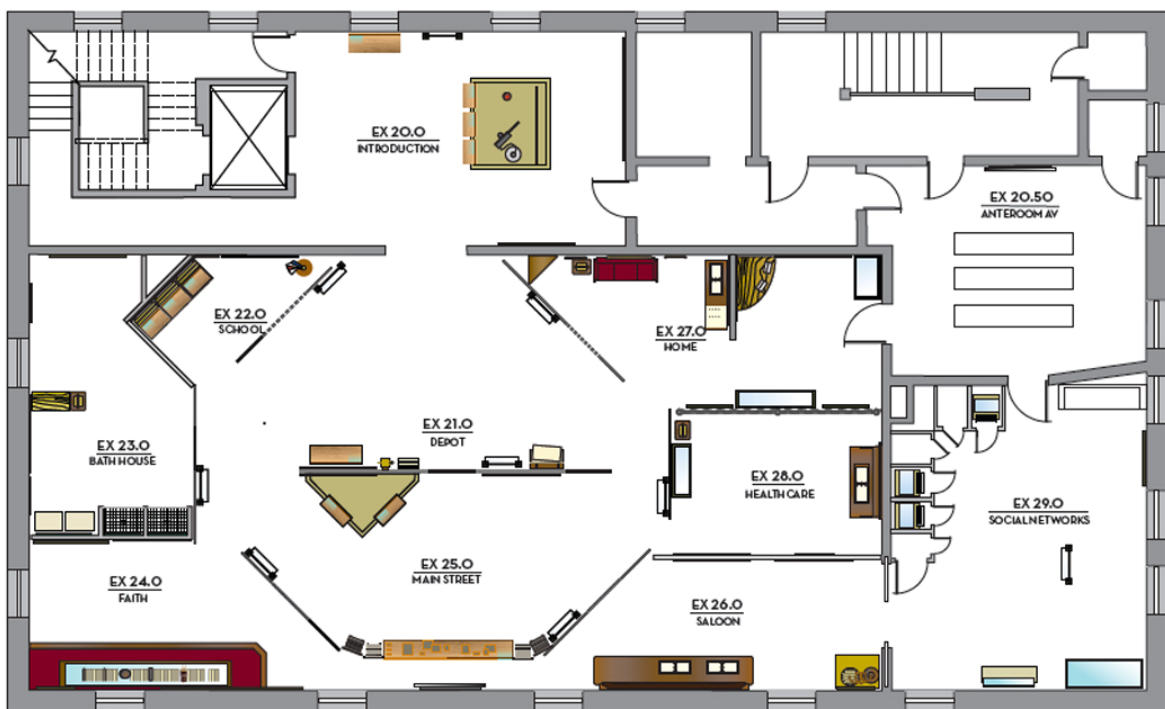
Exhibit Plan, Second Floor of Union Building, Alternative 2 (Office of Krister Olmon)
